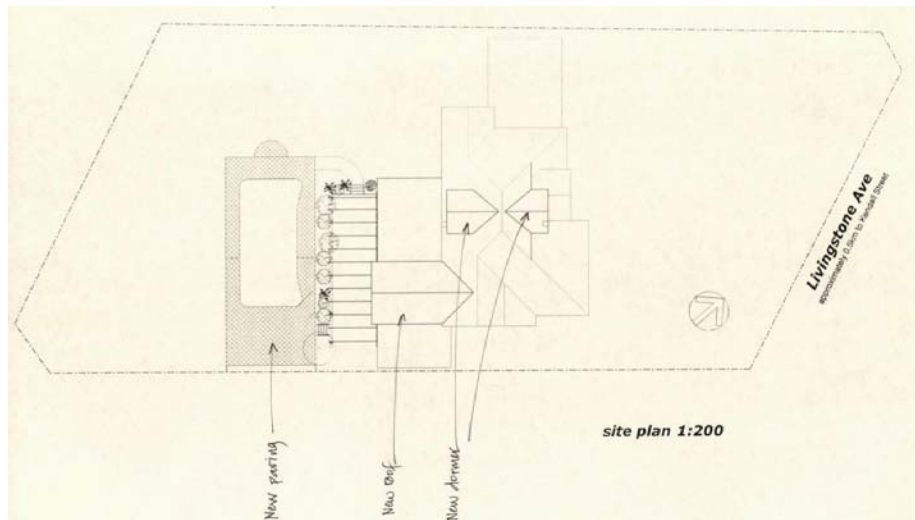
, Site plan showing proposed alterations in 1997, *Wayne McPhee and Associates
